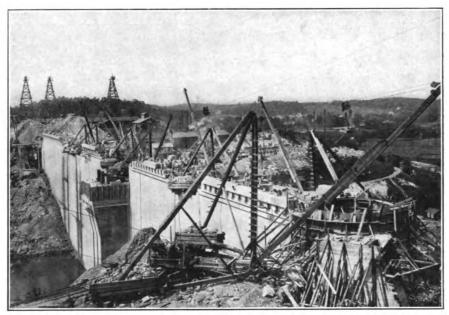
Fig. C.—Cross River dam nearing completion. Mixing plant and block-yard in background.
